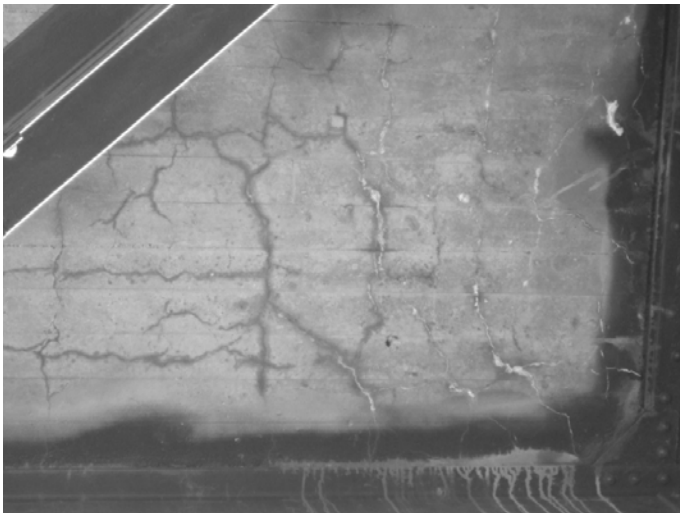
Close-up of the underside of the bridge deck. Moist cracks and white precipitations are visible.
